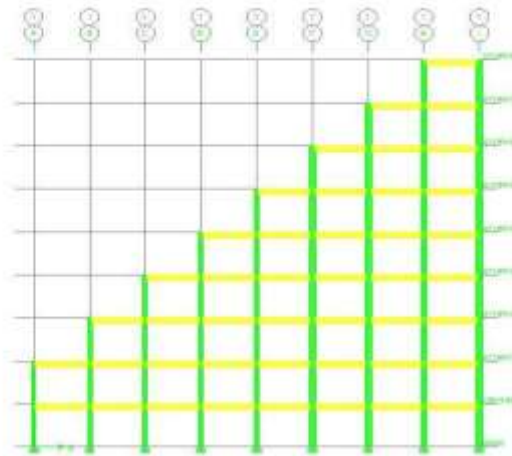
Elevation of setback building for eight storey model (00 slope)
